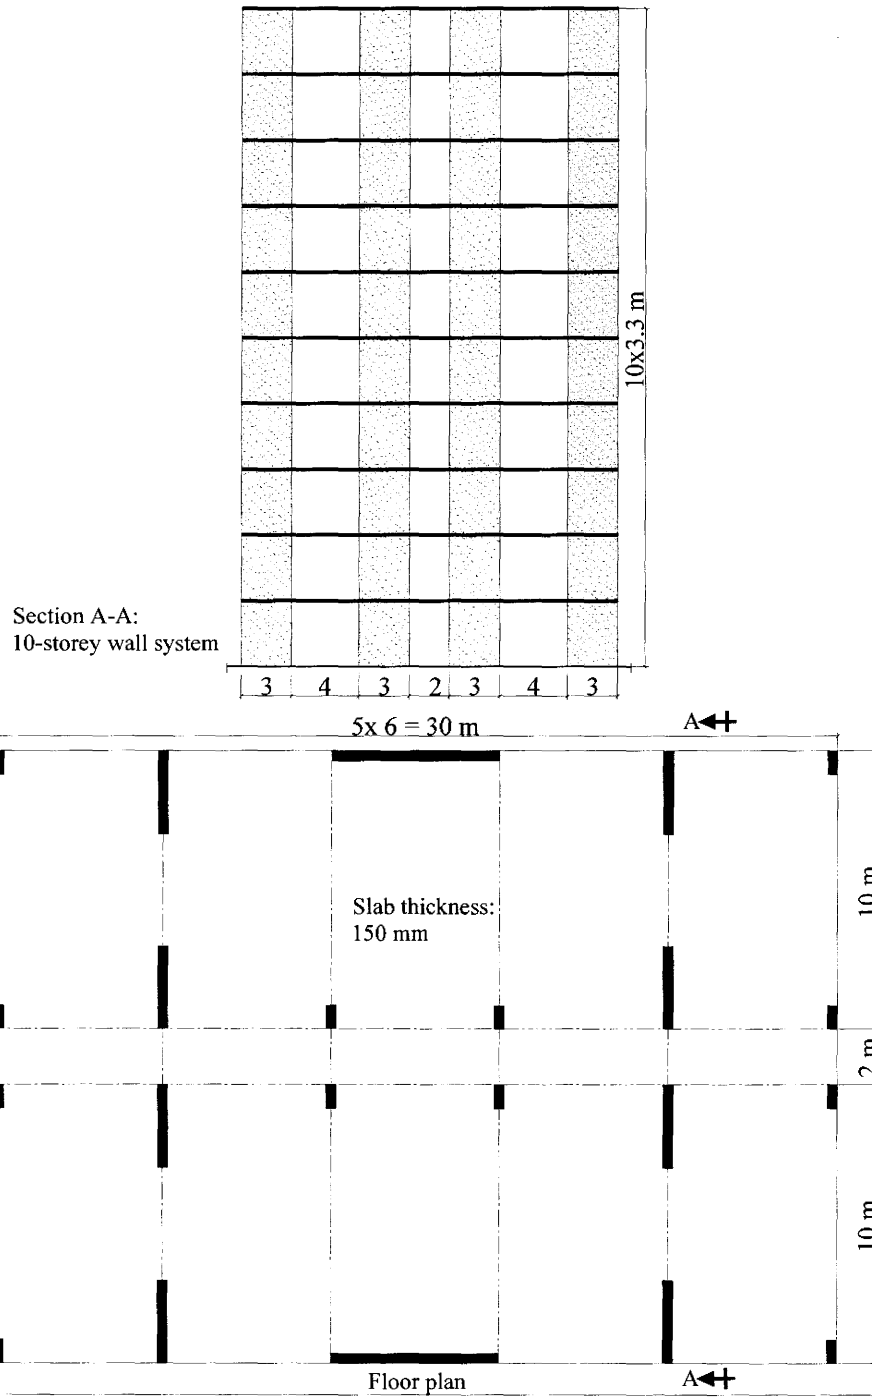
1 Plan and section elevation for the 10-storey RC building
